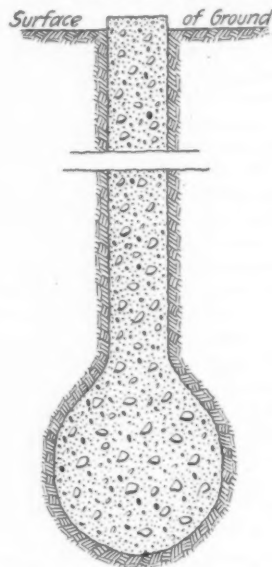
PEDESTAL CONCRETE PILE FOUNDATIONS.
